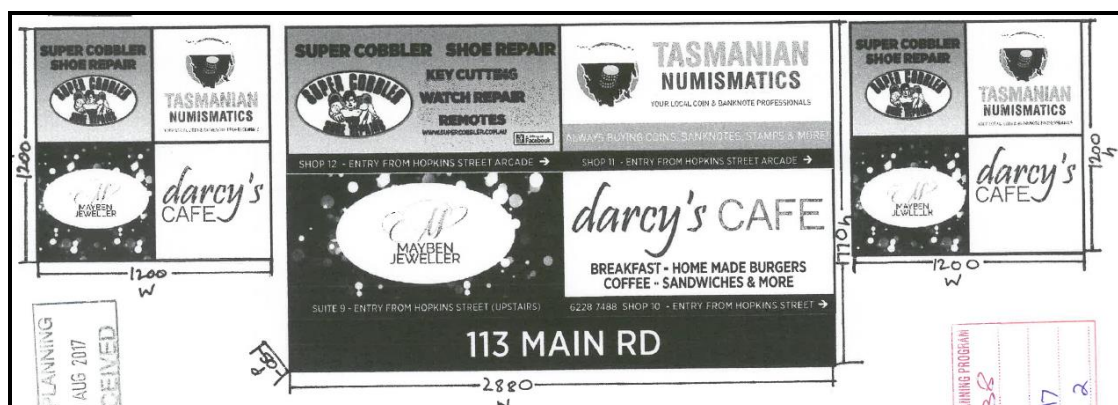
Snapshot of a schematic showing the three faces of the proposed sign – PLN-17-238 P1 Plans
